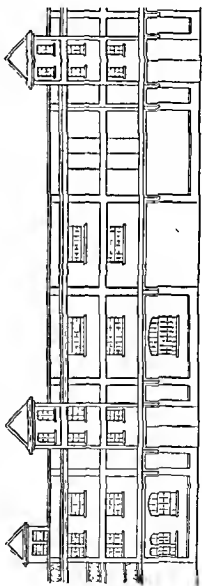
Part Elevation of 425-ft. long Transit Shed
